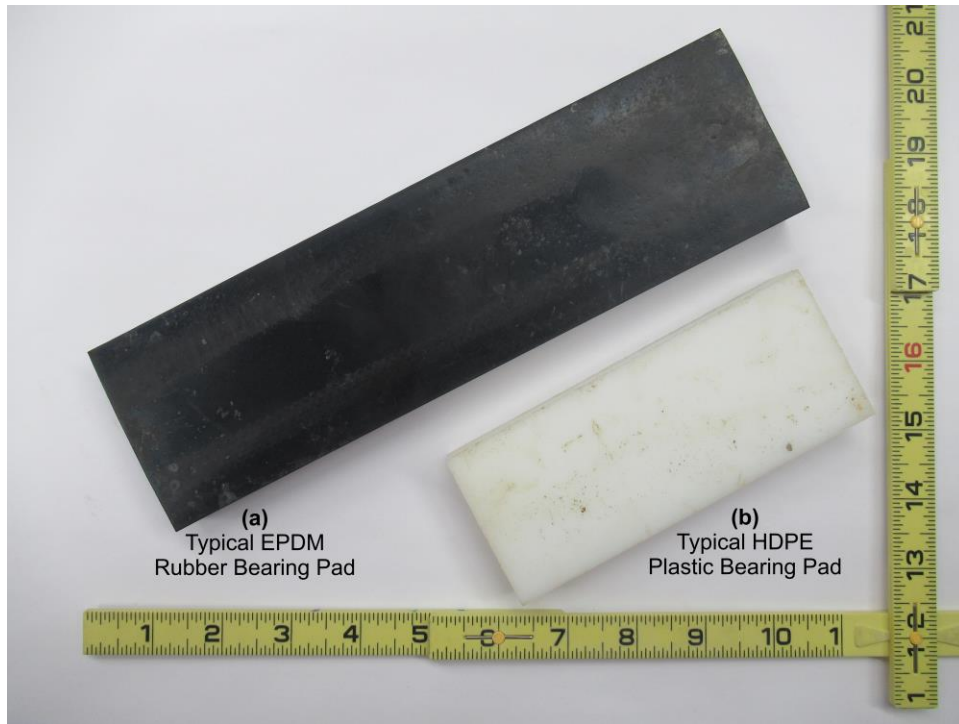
Bearing pad examples—(a) EPDM rubber bearing pad and (b) HDPE plastic bearing pad
